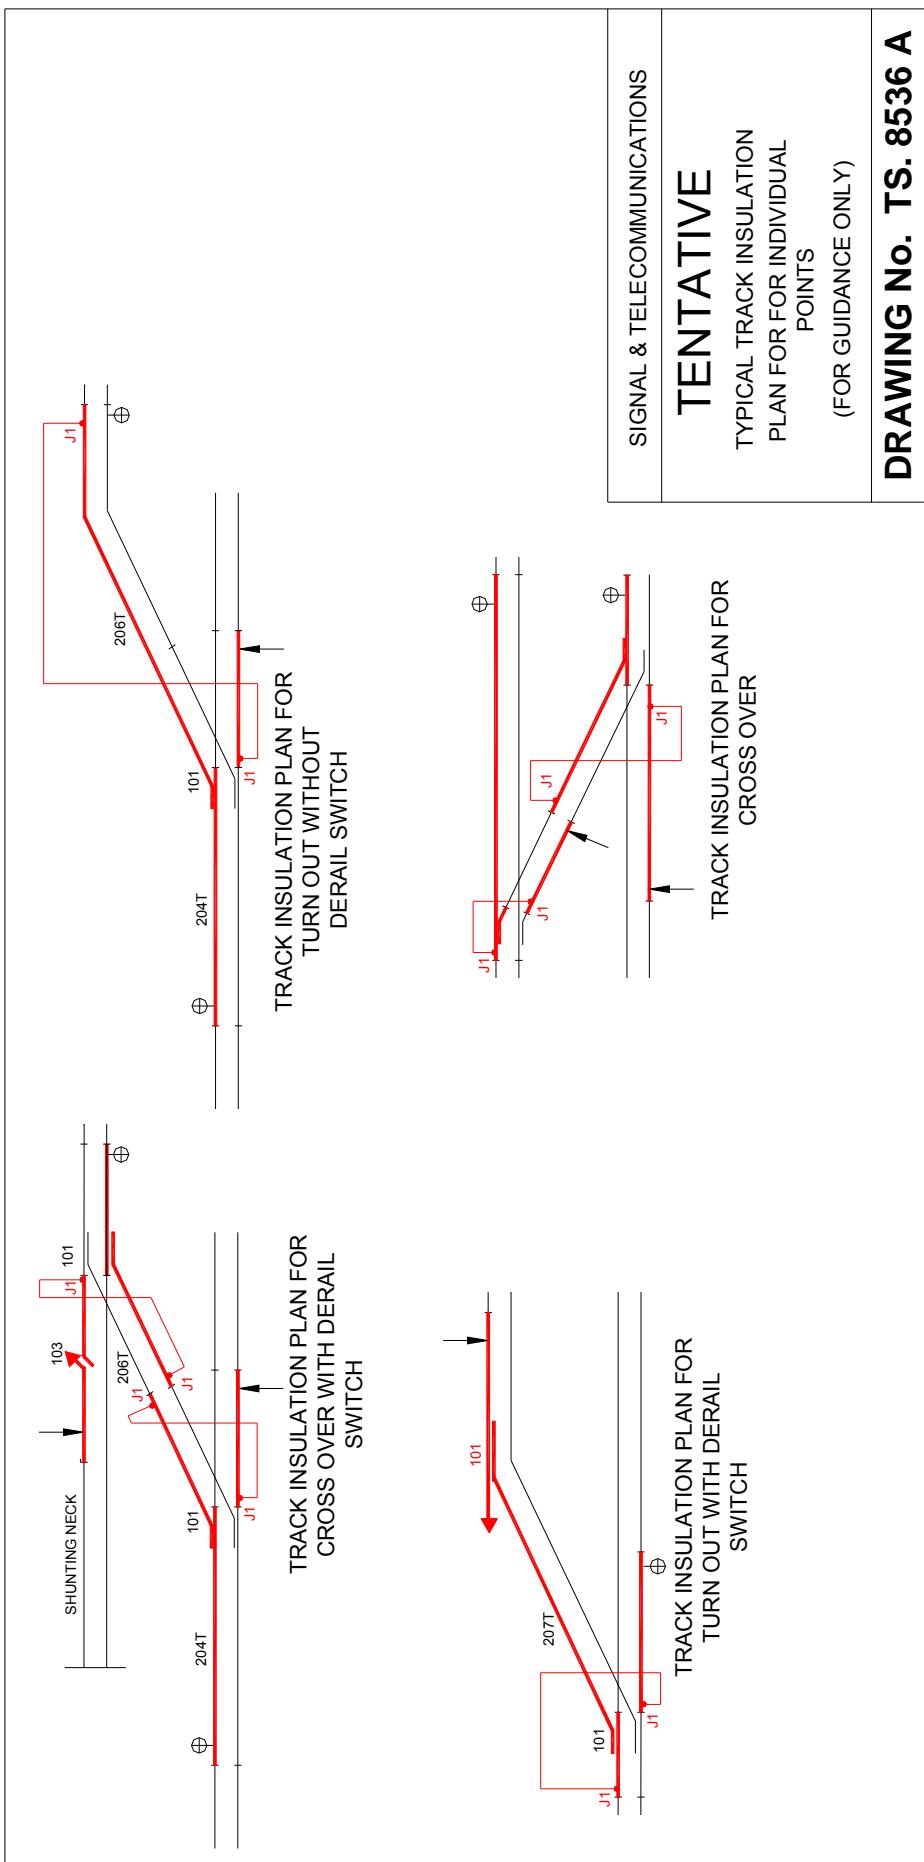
Typical Track Insulation Plan for Individual Point
